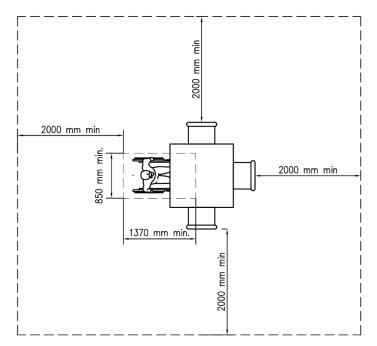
Accessible tables must have 2000 mm of firm, level ground surrounding them.
